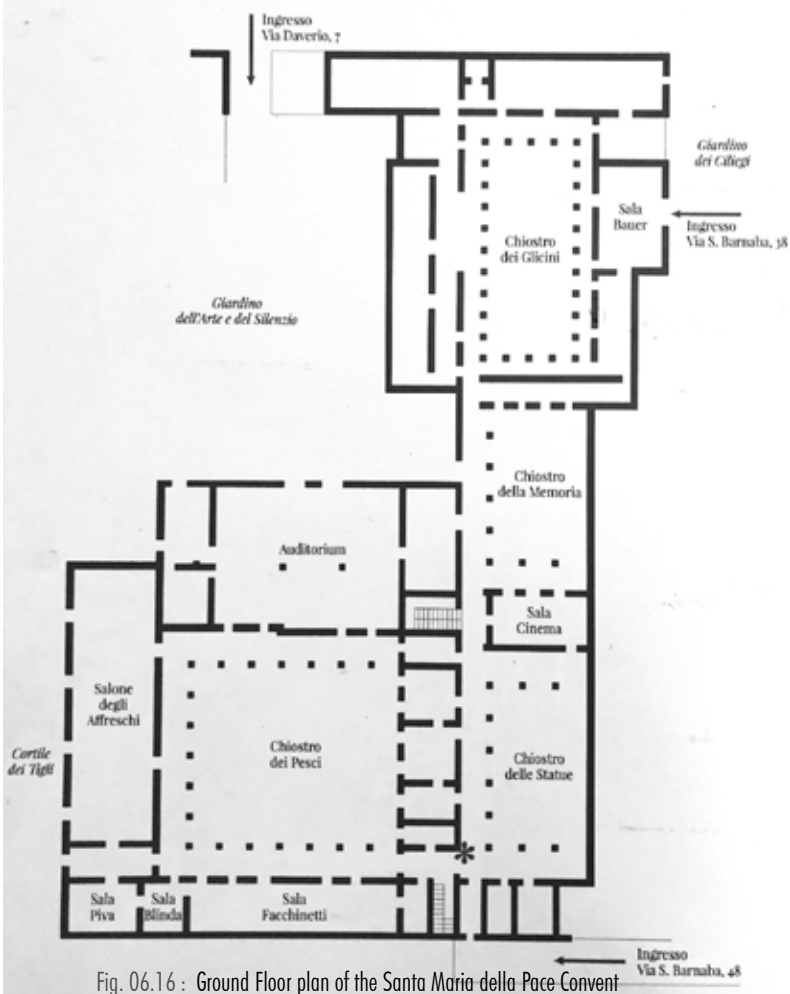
Ground Floor plan of the Santa Maria della Pace Convent
